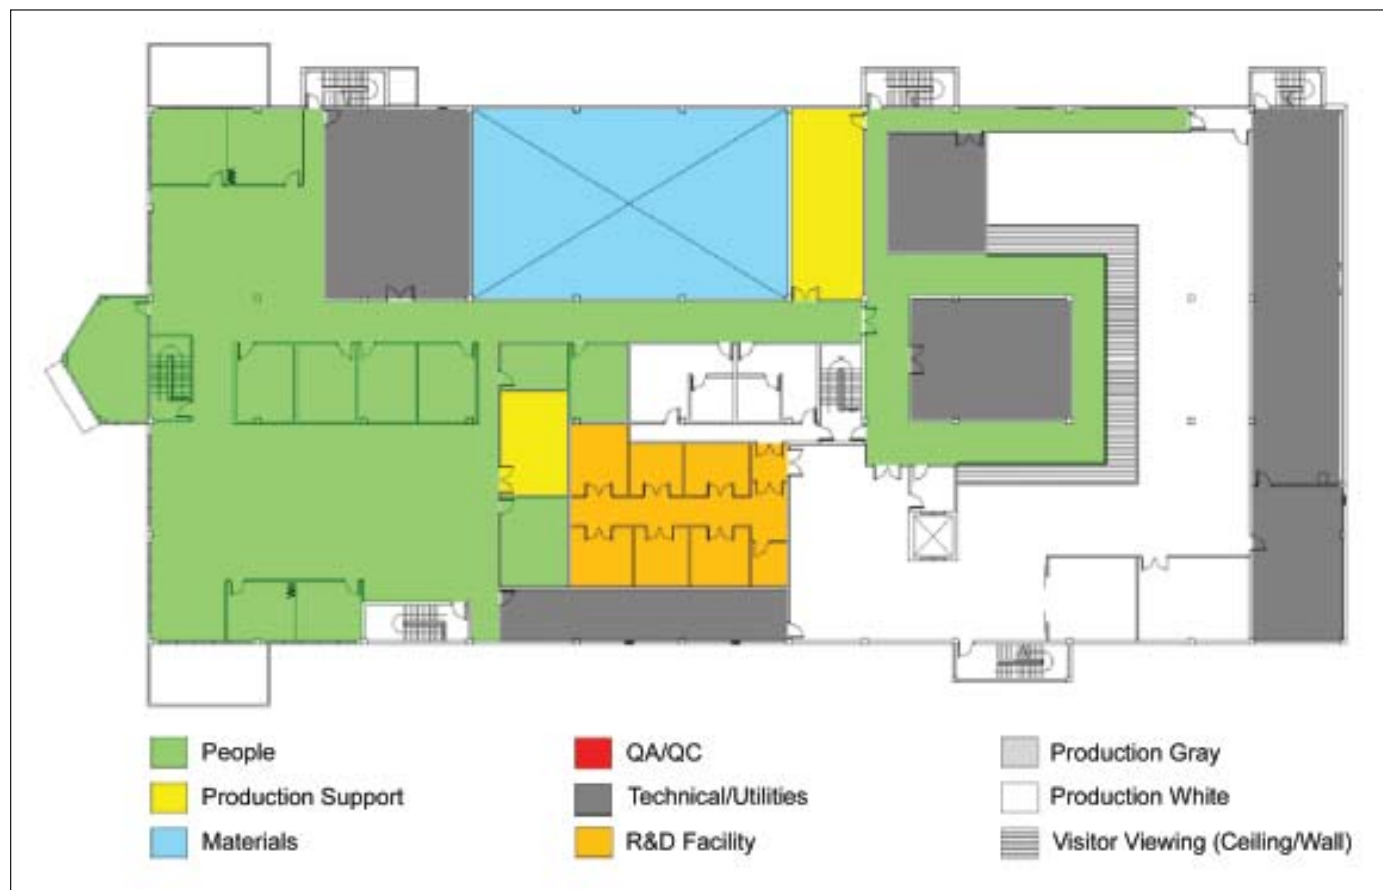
Upper floor (Level 2) U SPAH facility layout.
